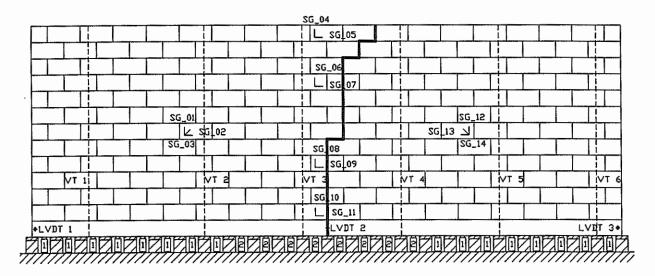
Failure of masonry wall reinforced with vertical tendons (HG 2).
